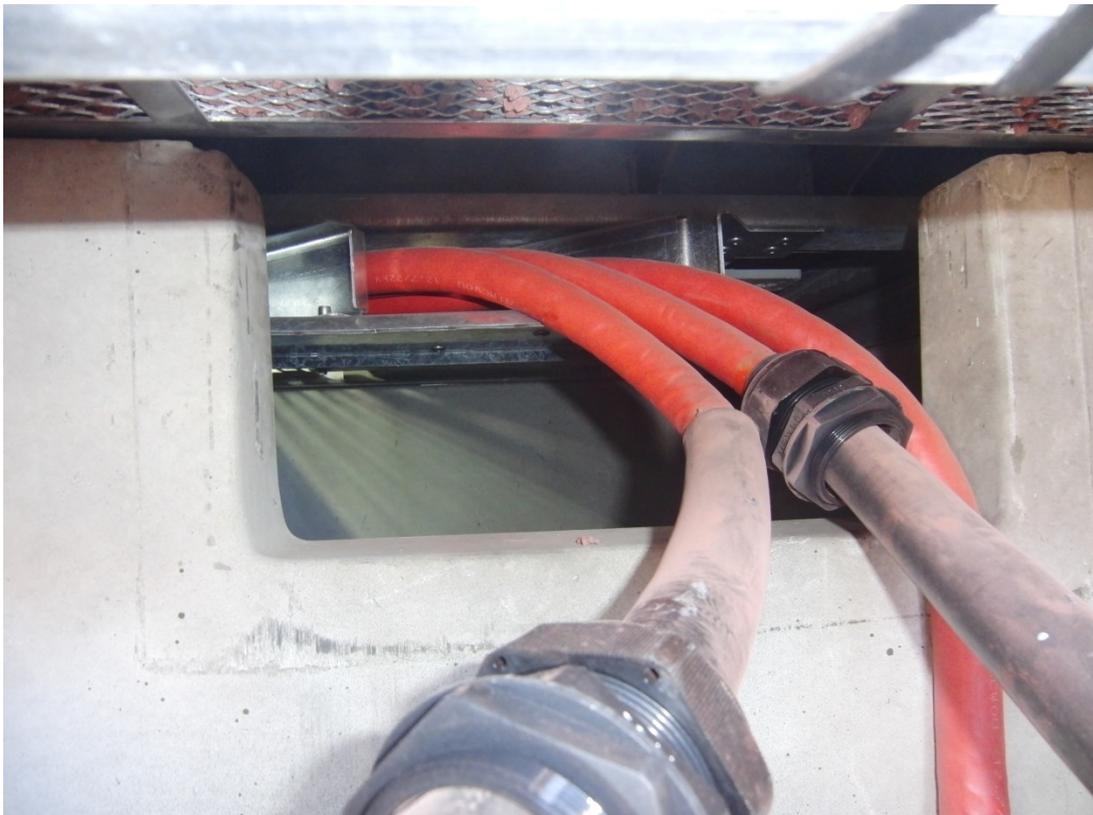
New cutout section between the transformer oil compartment and the HV section for the transformer cables
